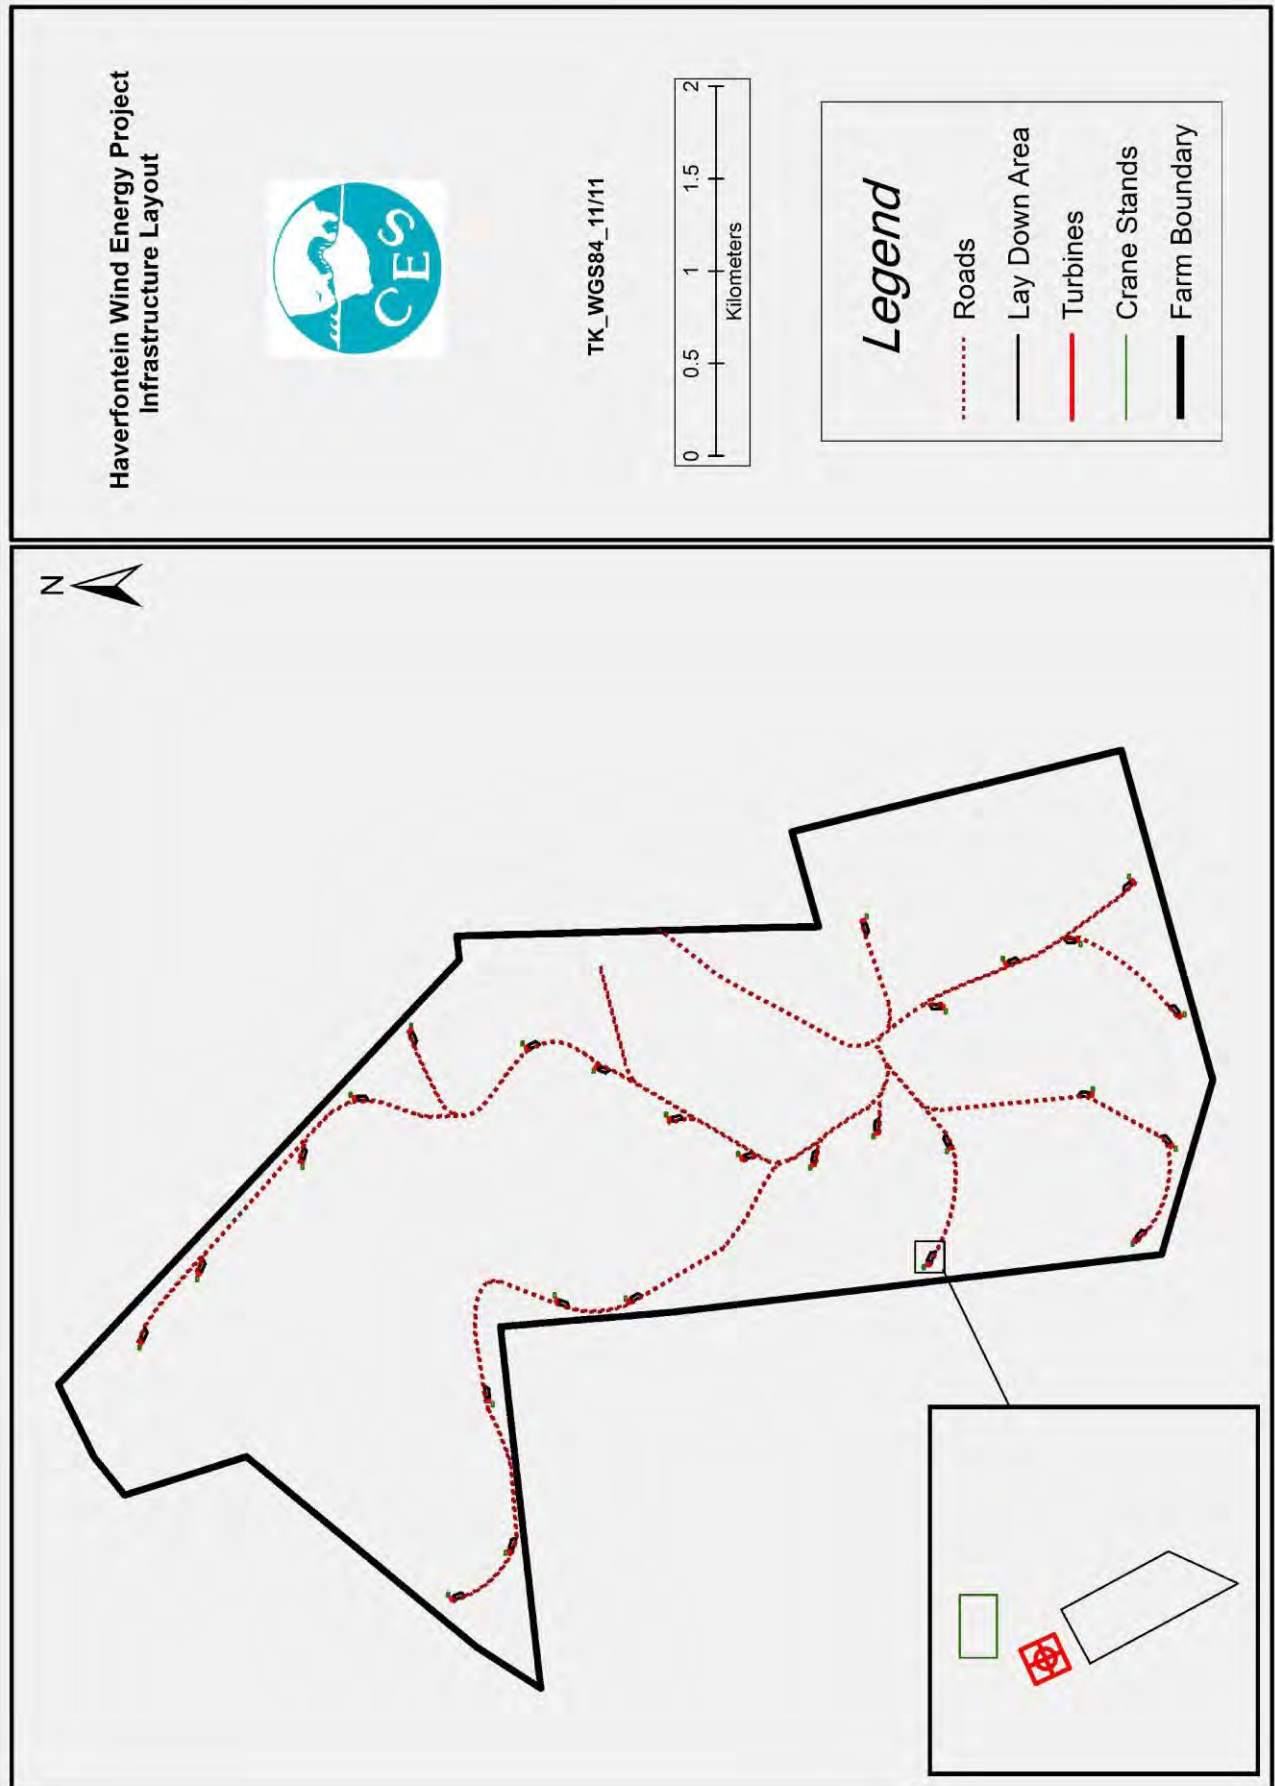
Overview of the proposed turbine layout including existing/proposed access roads and cable layout in the project area
